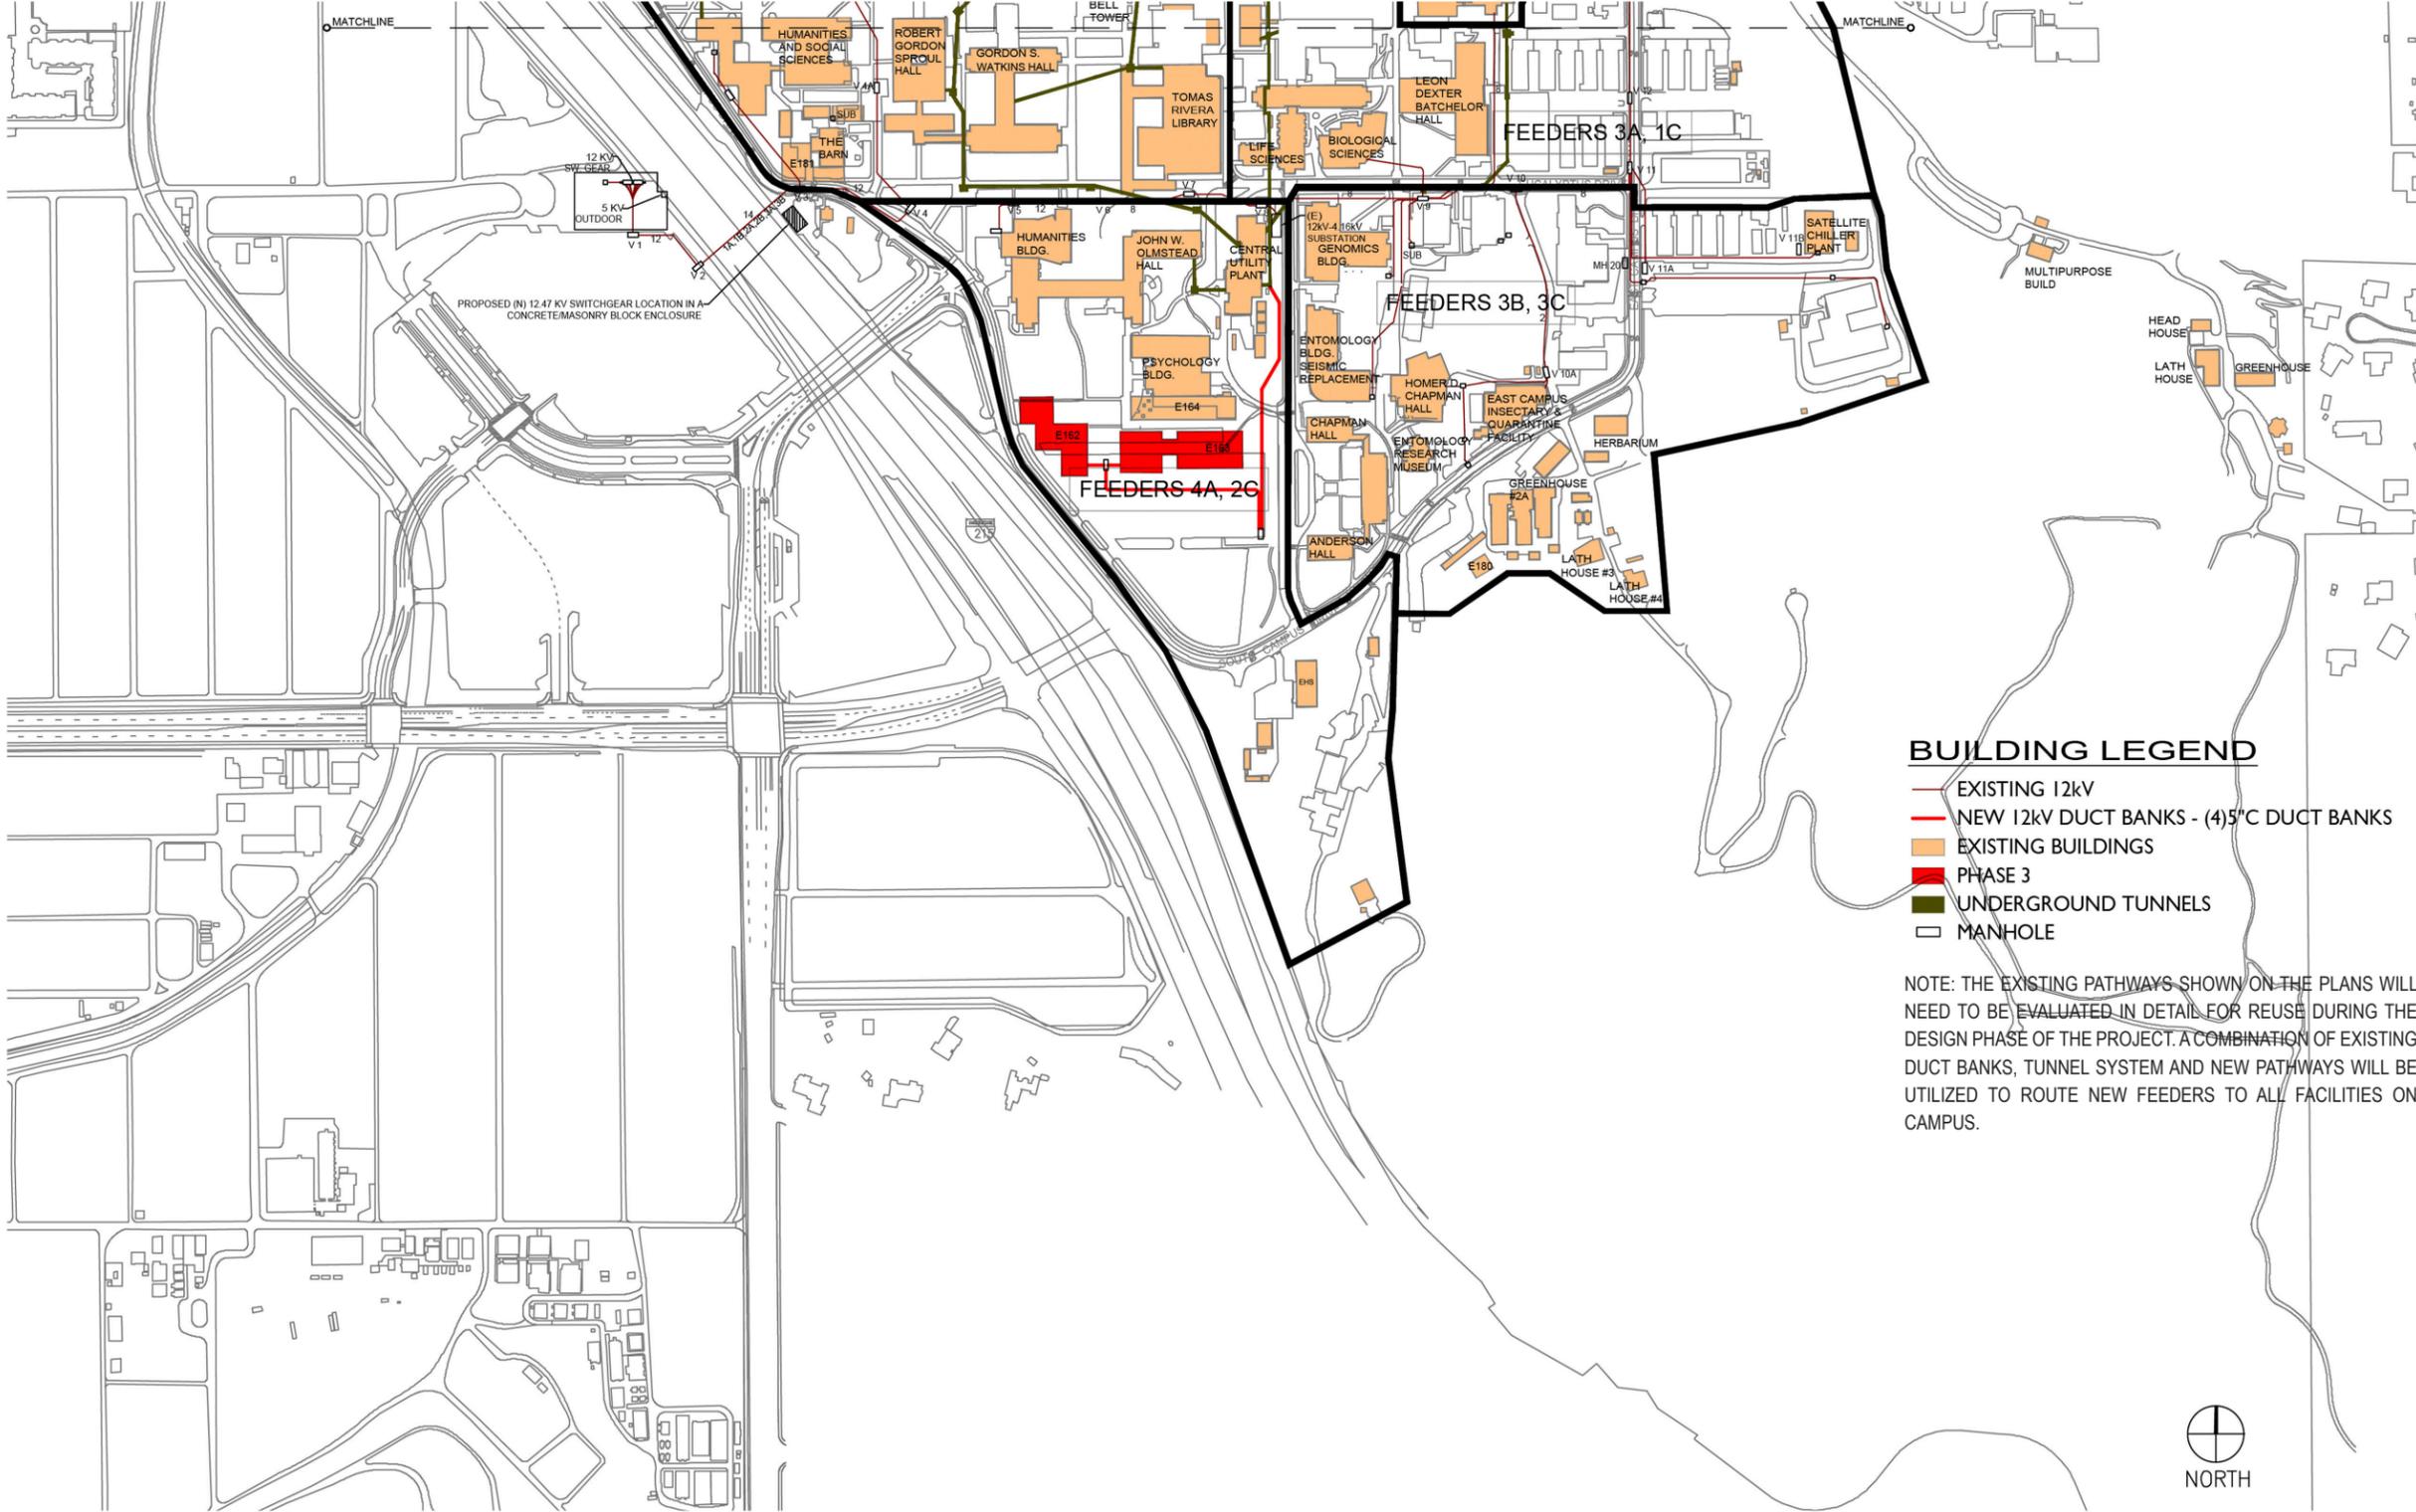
Phase 3 Buildings Electrical Site Plan—South
